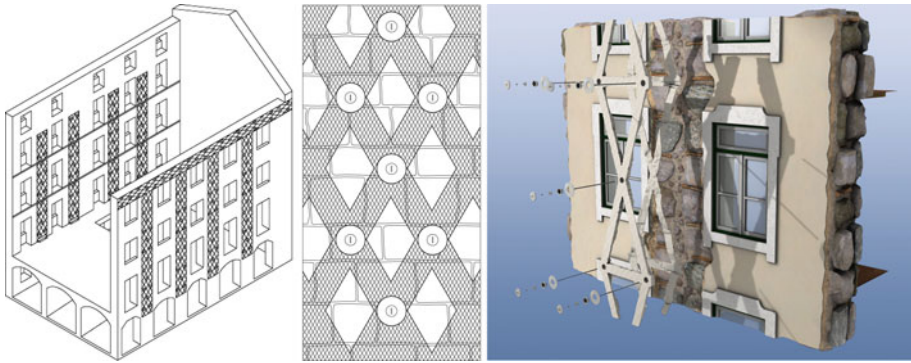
View of a masonry building reinforced with GFRP composite strips and anchorages (Cóias e Silva 2007). Although less effective for out-of-plane bending, strips are depicted oriented along oblique directions, with increased benefits for in-plane shear
